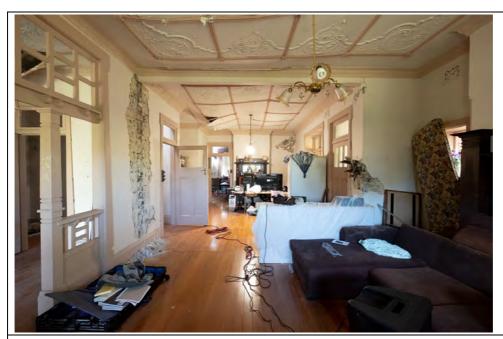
View of lounge room and dining room looking north, May 2019. Note damage to walls and collapsing ceilings
